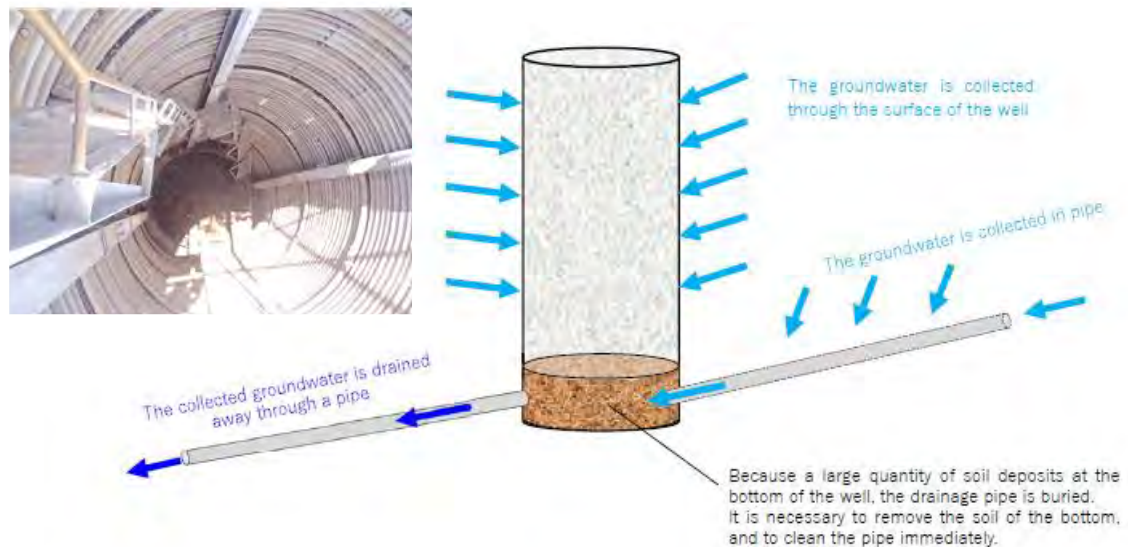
Existing drainage well in La Butte (Source: JET)
